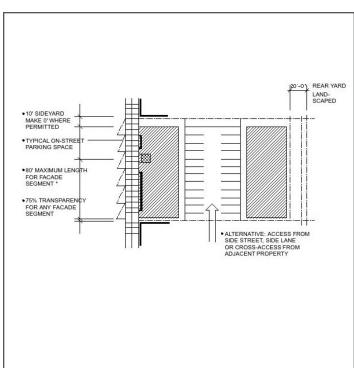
Site plan for intermediate infill site with narrow frontage and deep lot showing alternative access to parking.
